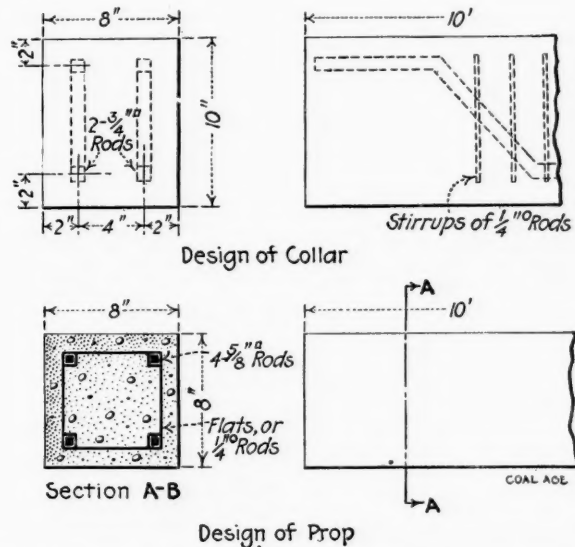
DESIGN FOR A REINFORCED-CONCRETE TIMBER SET
